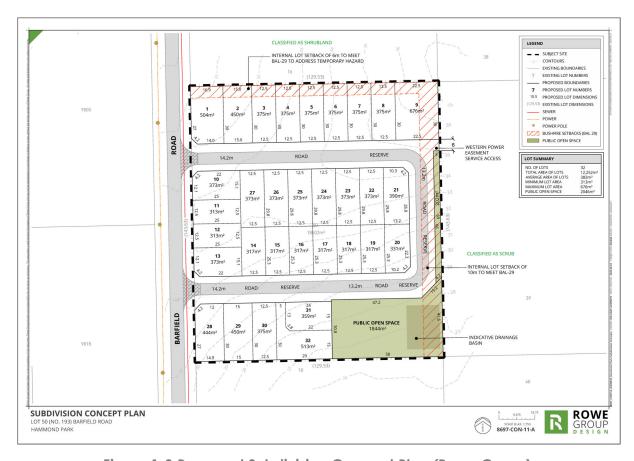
Proposed Subdivision Concept Plan (Rowe Group)
